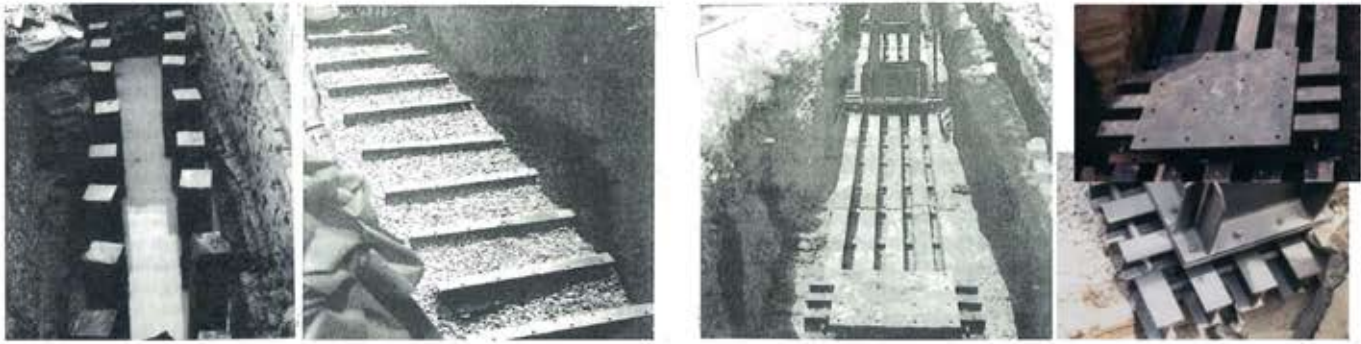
Wooden Pile Group, Pile cap, Pebble filling, Grillage and Cap plate to accept Base plate
